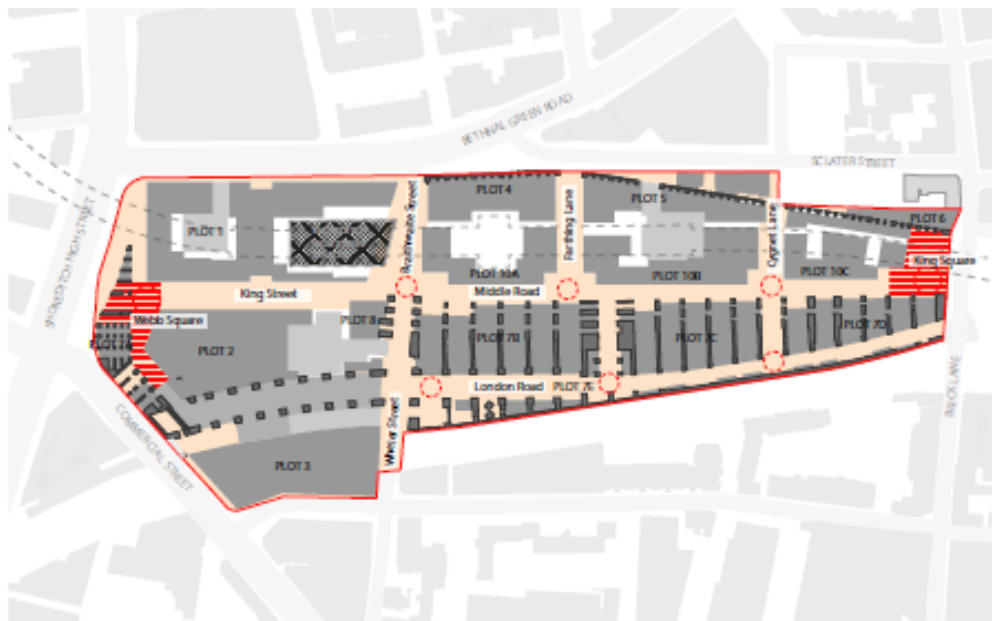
2020 ground floor plan showing improved connections and two public spaces at the western and eastern ends (red highlight, Webb Square to the west, King Square to the east)
